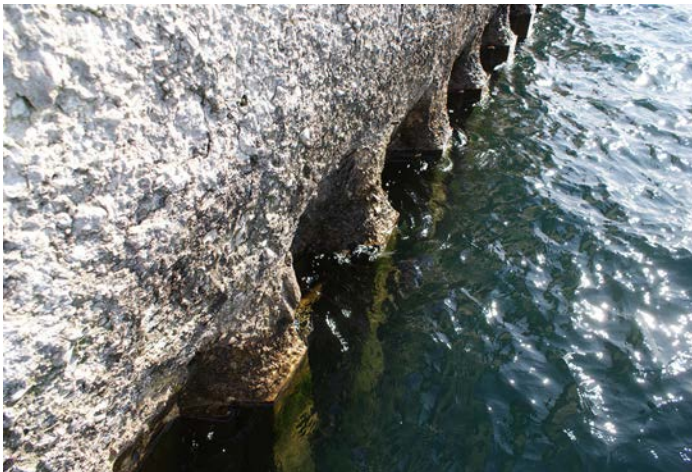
D-66 Deteriorated concrete near the water surface above the steel sheet piling.
